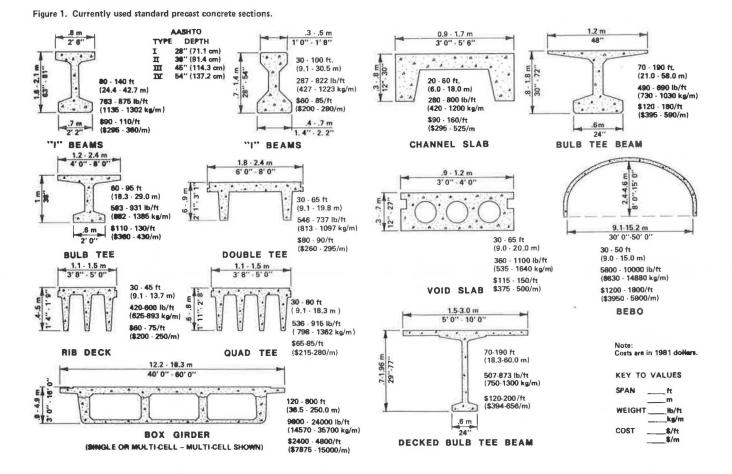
shows the different types of currently used standard precast concrete sections. It also indicates the ranges of section depths, widths, span lengths, weights, and current costs. Precast concrete sections such as these are very widely used and have proved to be very competitive with rolled and built-up structural steel sections. Many states and fabricators have developed their own standard sections and have promoted their use. This has resulted in cheaper superstructure components and total bridge systems that require minimum material and on-site labor.
